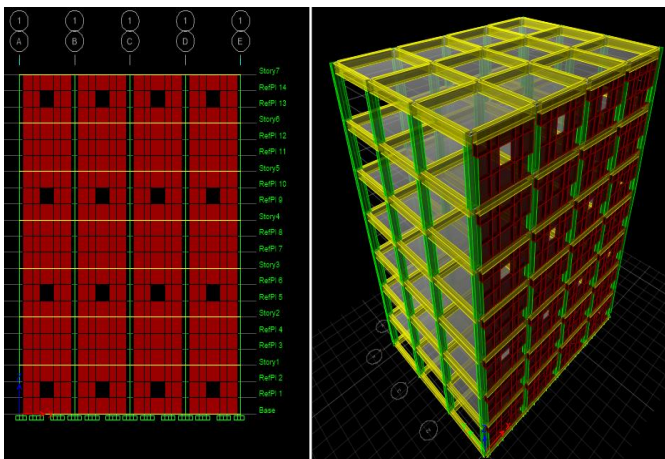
Modeling of structure with shear wall having openings arranged in horizontal direction
